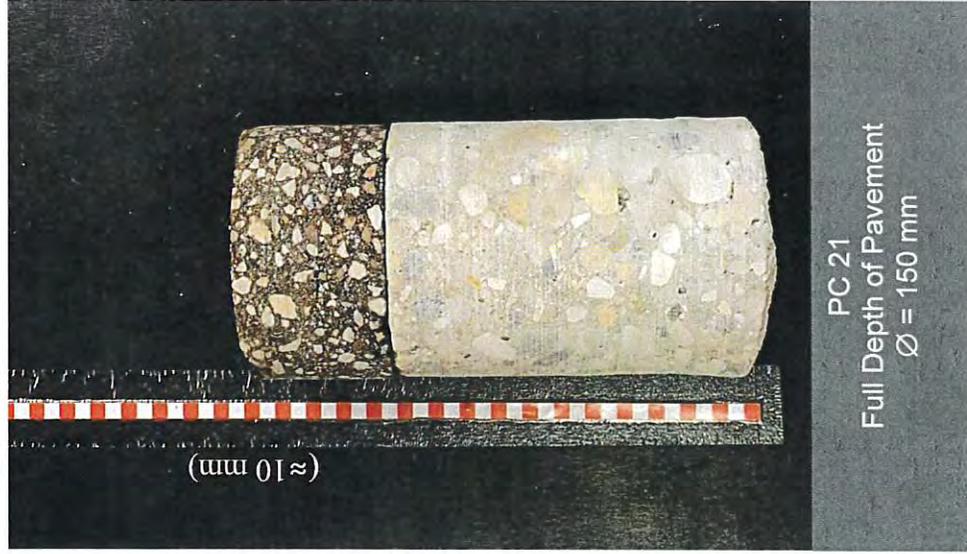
Specimen from Partridge Avenue, Eastbound North Curb Lane
